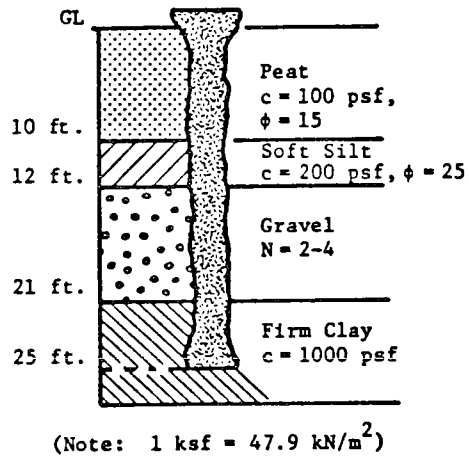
TYPICAL SOIL PROFILE AT MUNICH, GERMANY - RIGID STONE COLUMNS.
